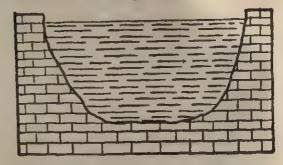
Section of a dam to show that the walls are wider at the bottom.
